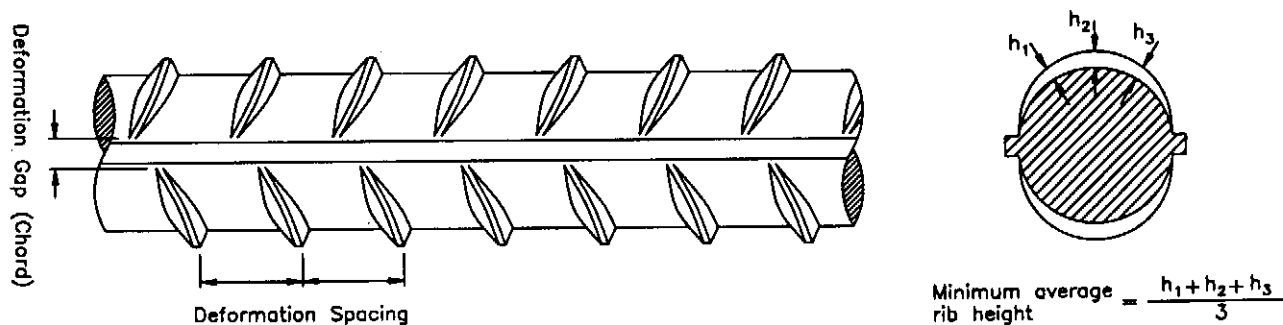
Deformation pattern of Grade 400Y reinforcing bars to AS 1302
